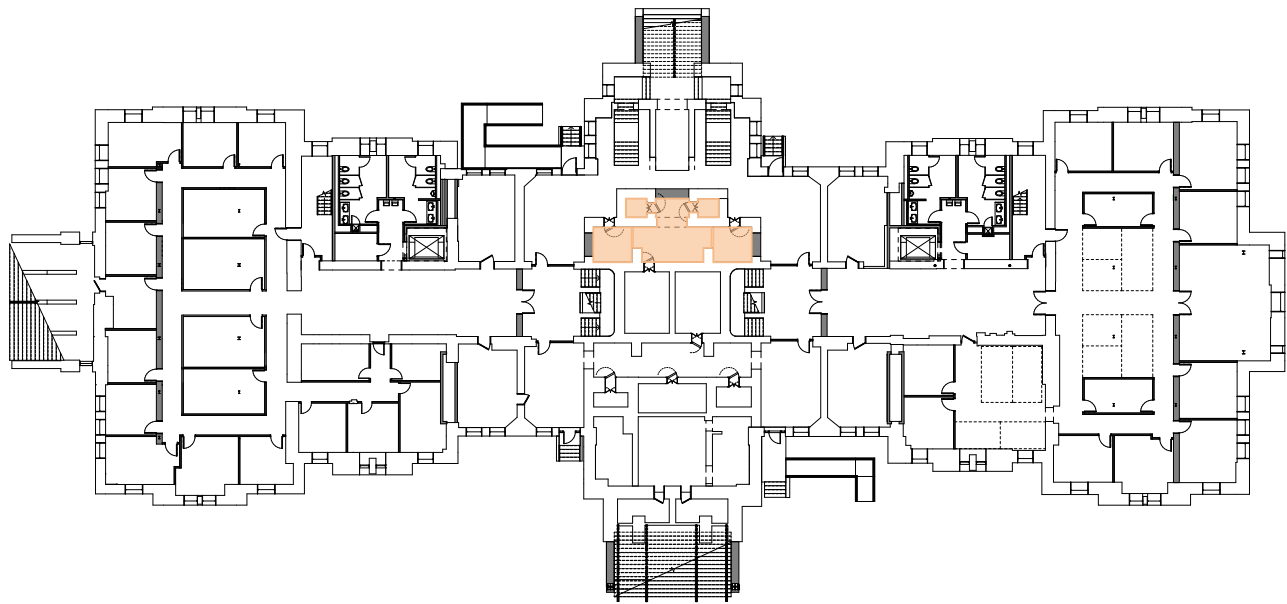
Proposed Space Allocation: Security- Garden Level [Capitol]
